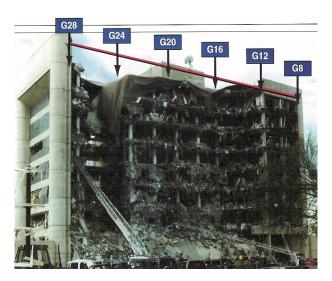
Murrah Federal Office Building after 19 April 1995 attack
